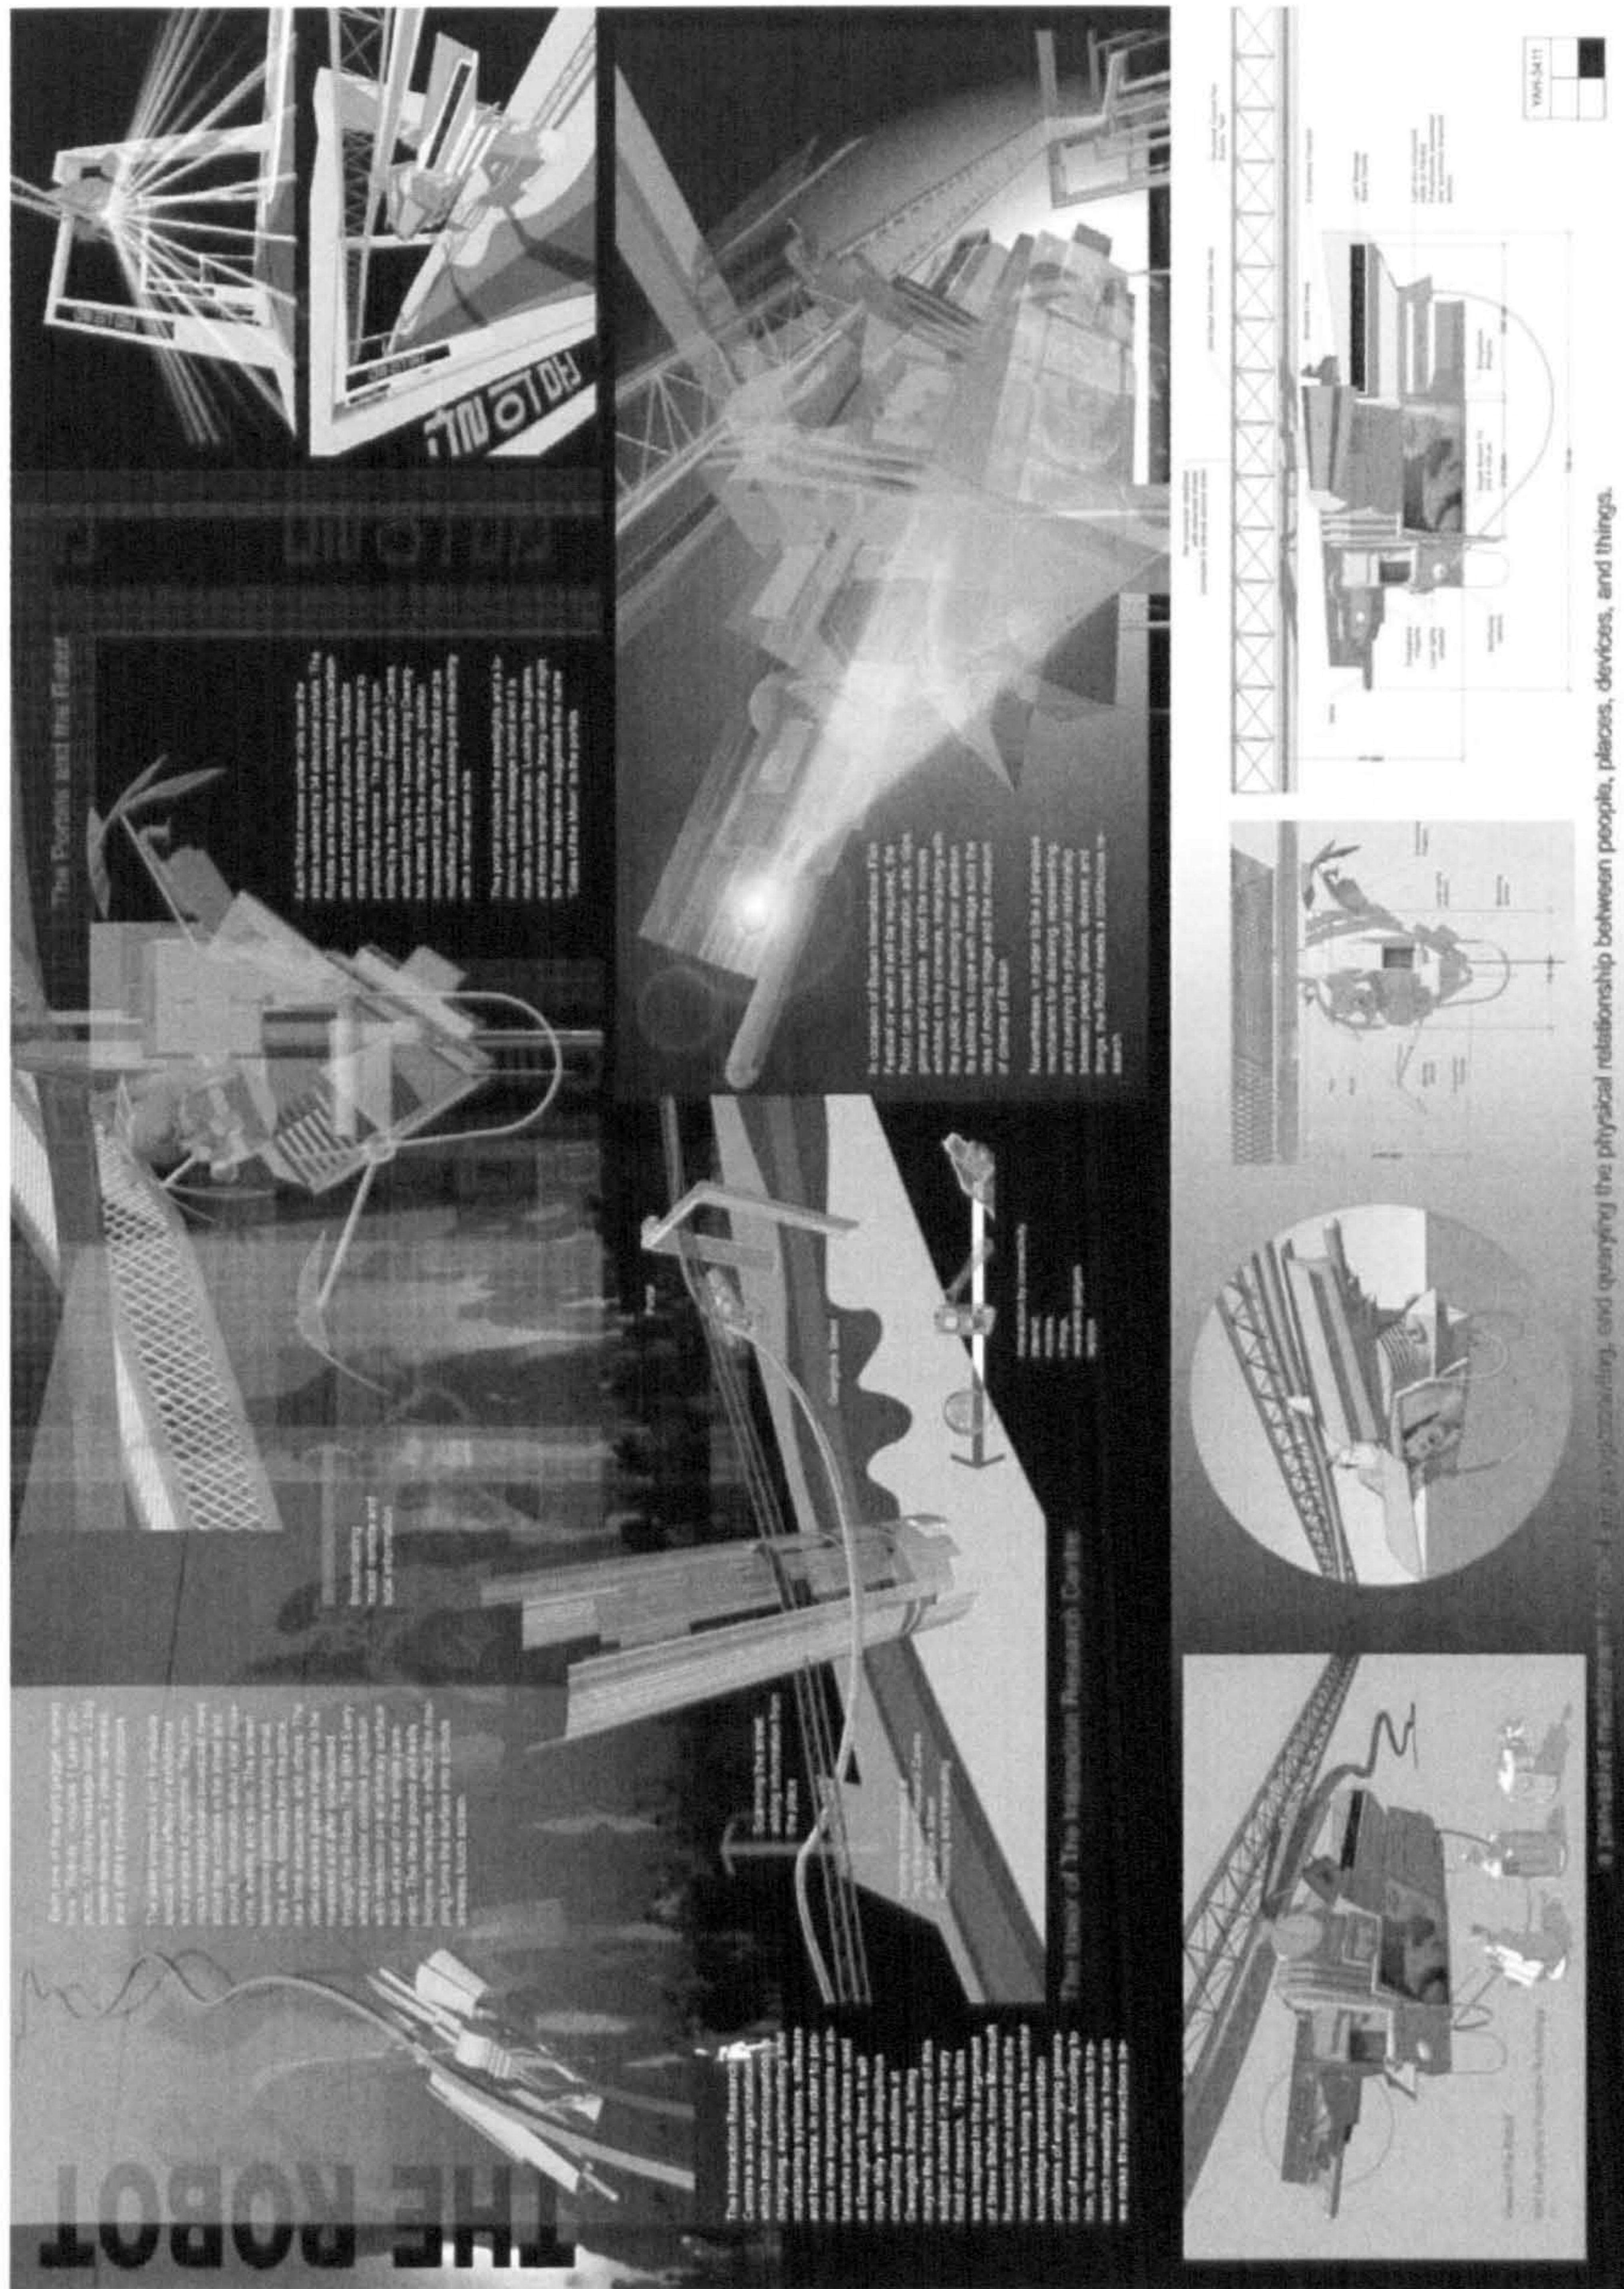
Fourth page of drawings, contest to revitalization of Gwangbok Street and PIFF plaza, 2005.
